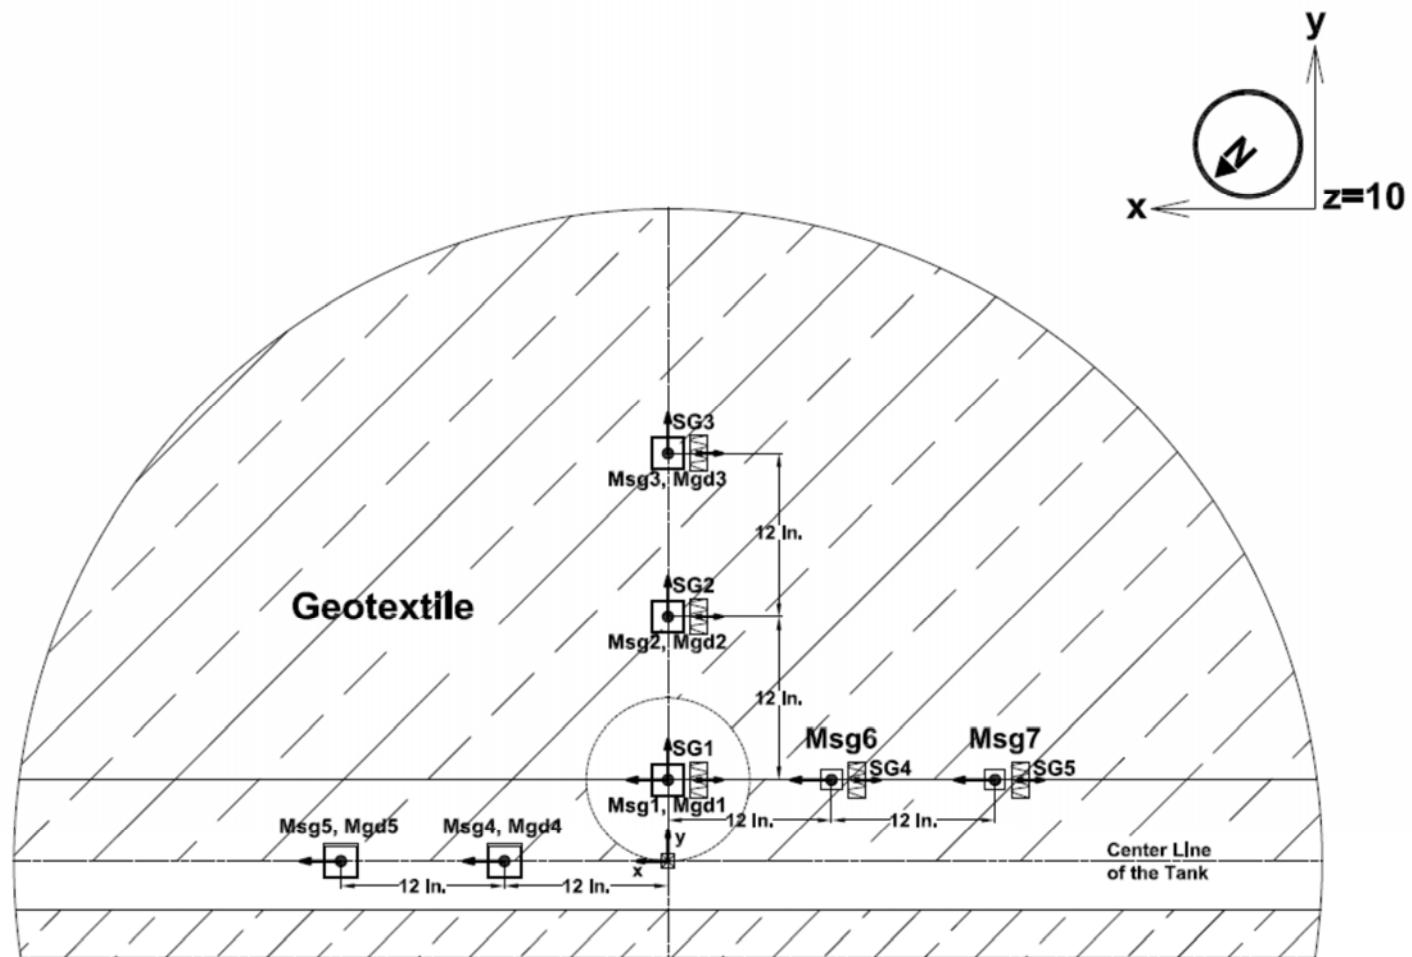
Instrumentation plan for experiment No. 10—Plan view, Z=10 inches
